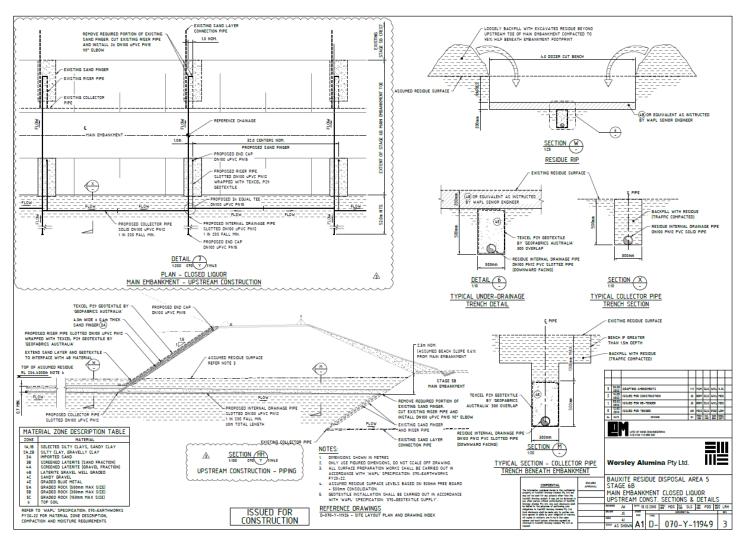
Diagram of construction works closed liquor system detail on upstream embankments
